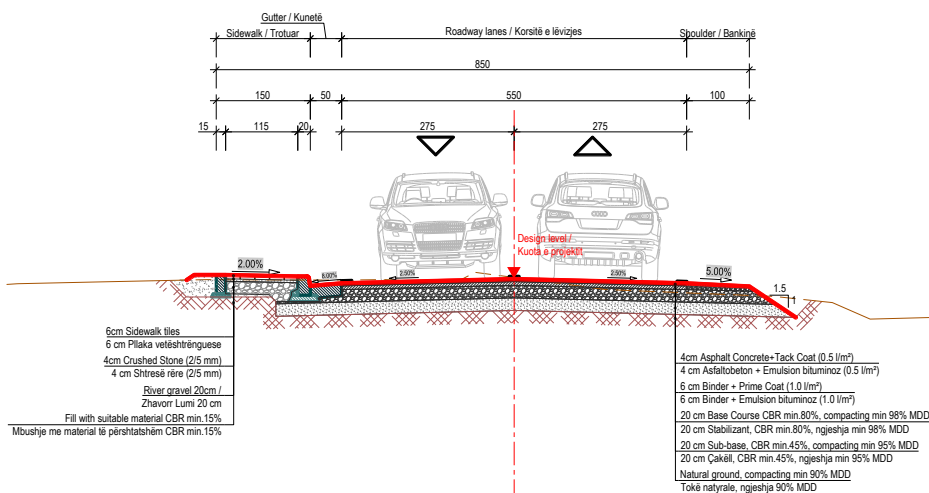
Typical Cross section No. 5 - Urban Local Road "F3-mod"
